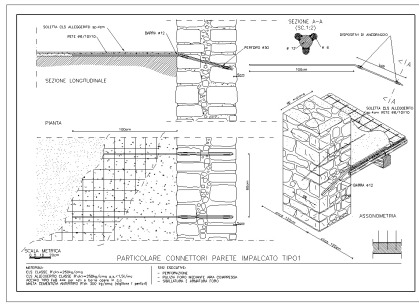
Typical floor-wall tie detail from floor diaphragm to new stone masonry wall construction.
